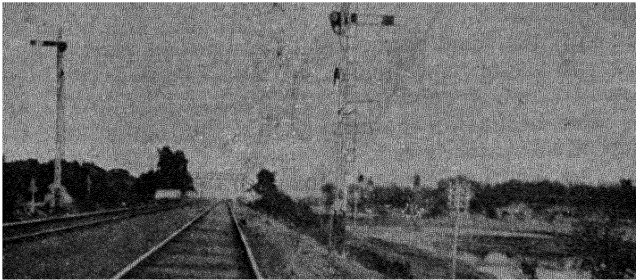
RAILWAY EMBANKMENT FORMING BORROW PITS.
